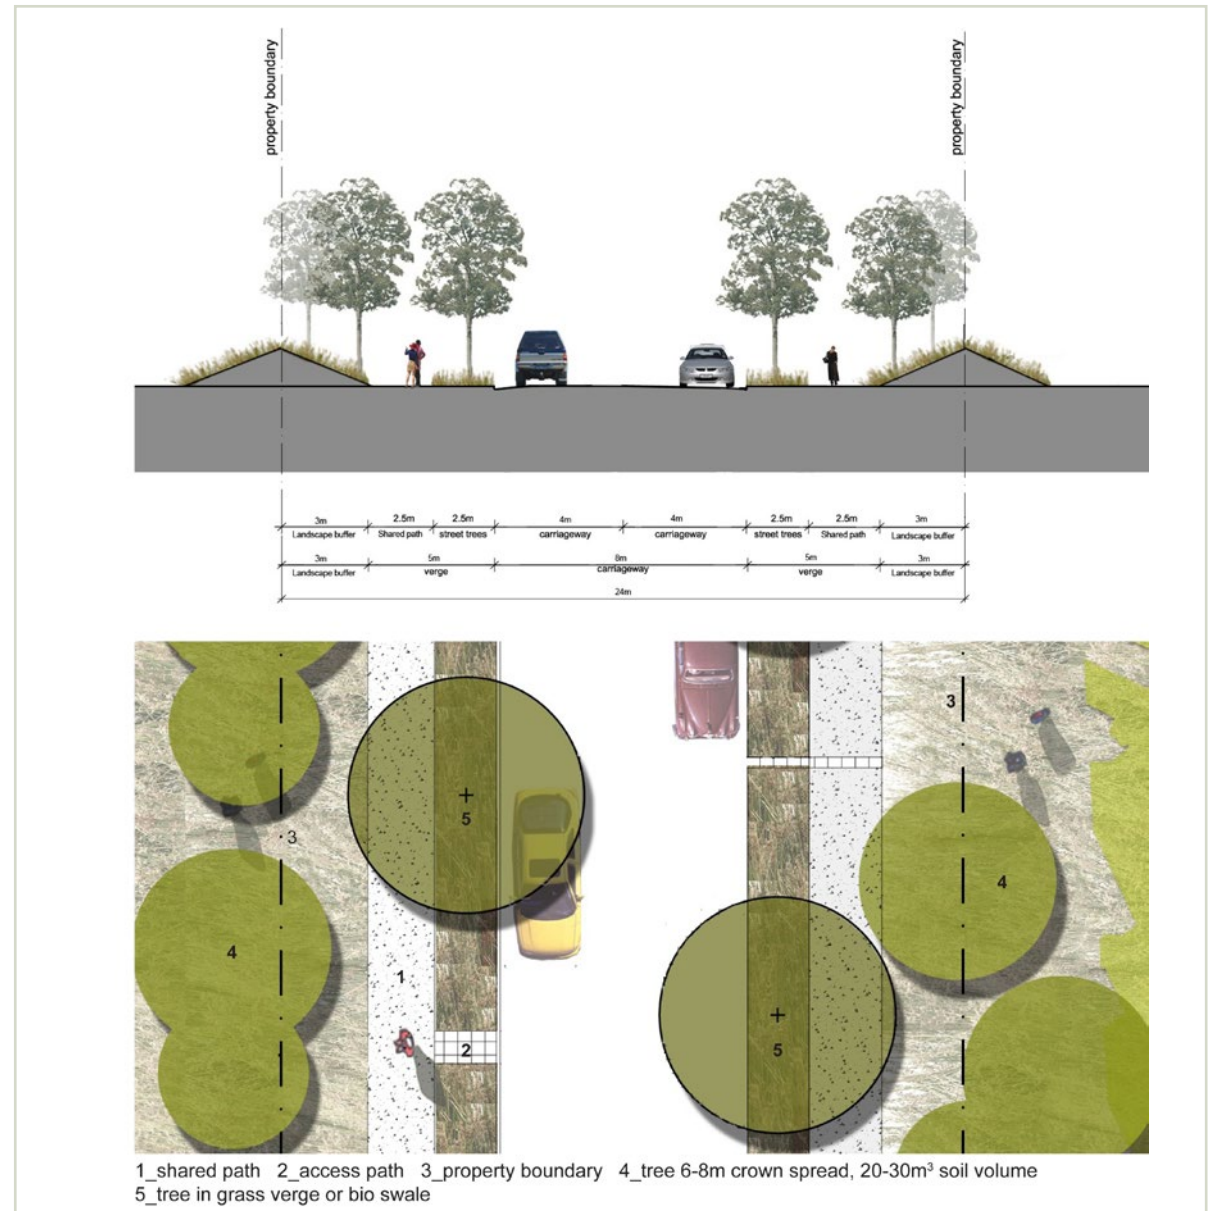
Collector Road A - 24m (Section 3-3)
